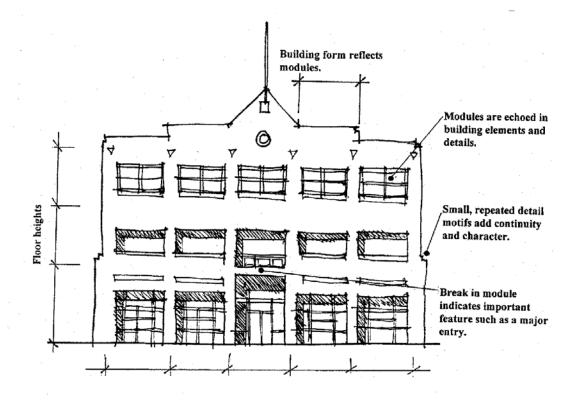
Building divided into modules, to facilitate related the buildings 'parts' to the 'whole.'
